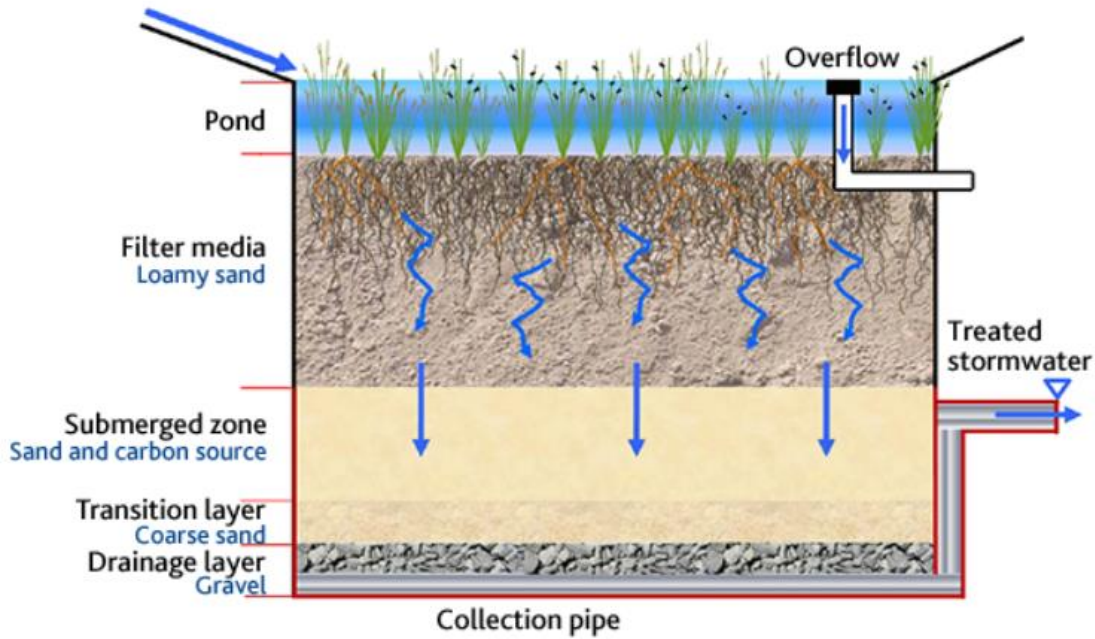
Typical Raingarden Detail (<https://www.melbournewater.com.au/>)
